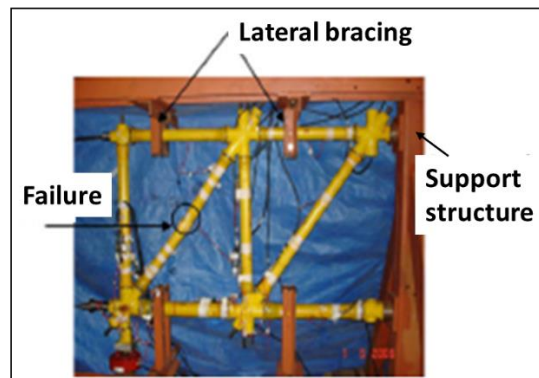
Cantilever trussed beam (Pfeil et al. , 2009)
